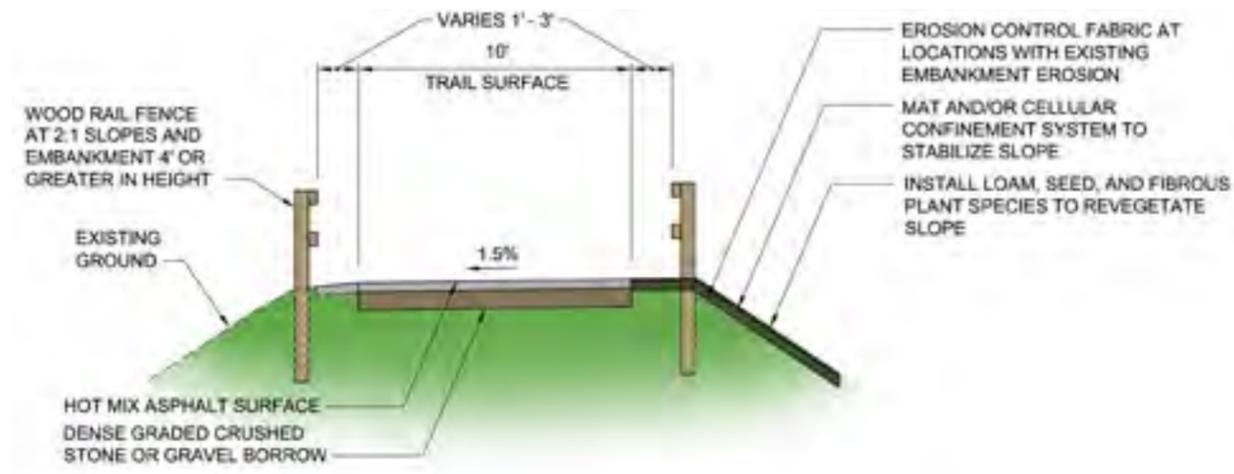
SECTION E-E: TYPICAL TRAIL IN FILL SECTION WITH SLOPE STABILIZATION
